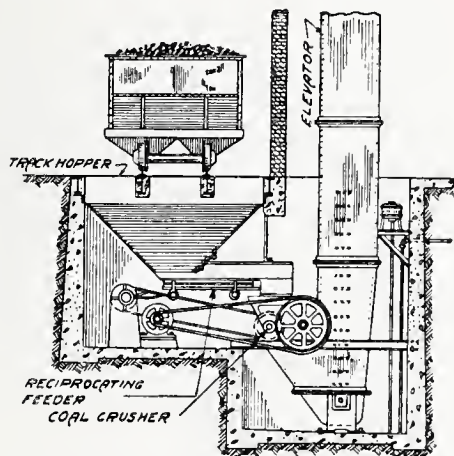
Raw Coal Delivery (Lump Coal) Track Hopper, Feeder and Crusher. (Grindle System.)
